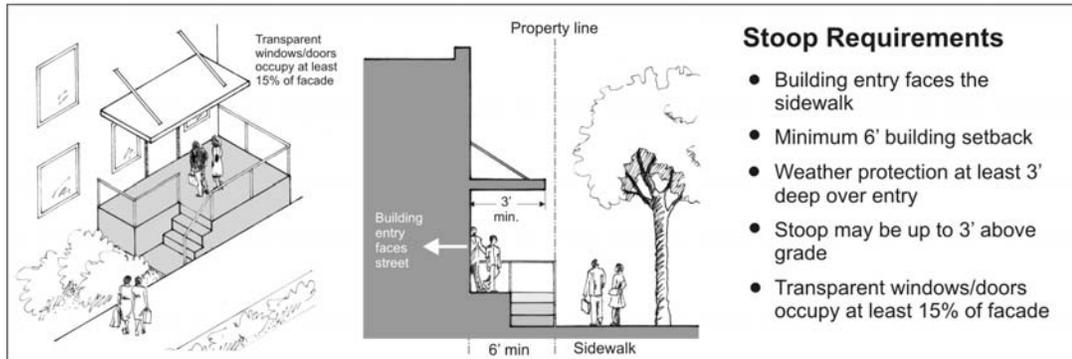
Stoop requirements. Note that stoops are permitted on designated Secondary Streets, but not on Storefront Streets.
